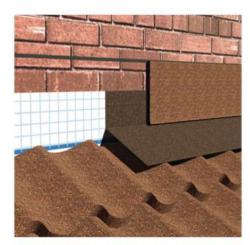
The adjoining of roof pitch to the wall sideways on the slope
